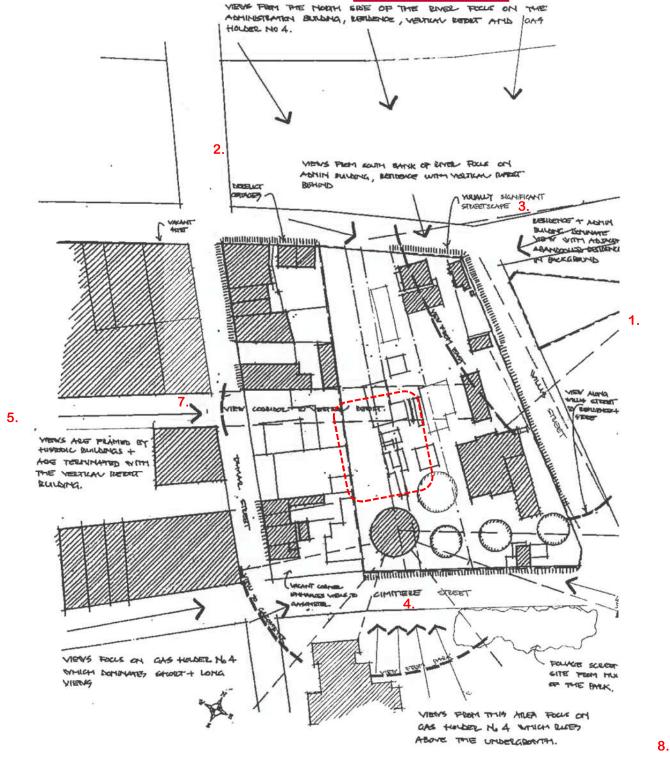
Site plan showing assessment of views and vistas to and from the site Paul Davies 2003
